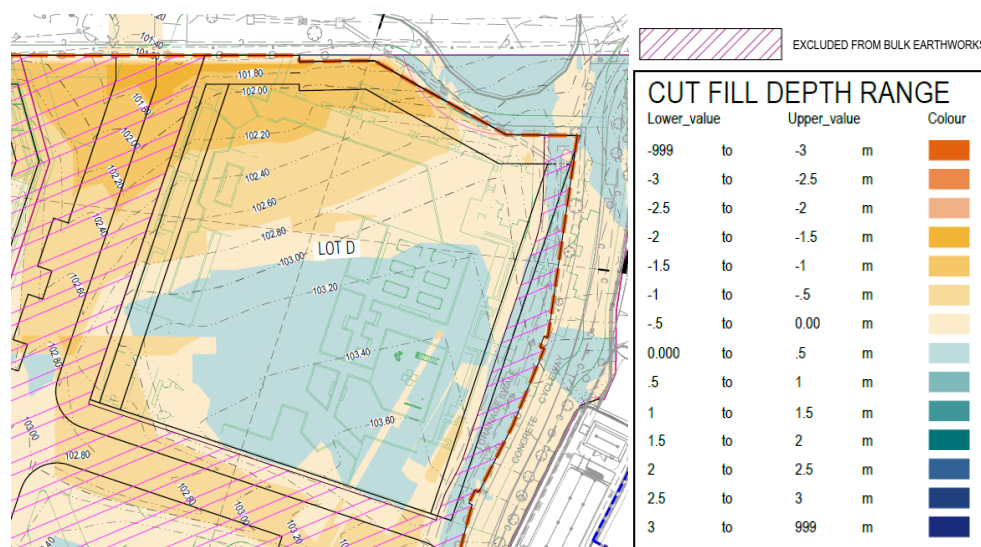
Proposed cut and fill plan (Source: Arcadis)
